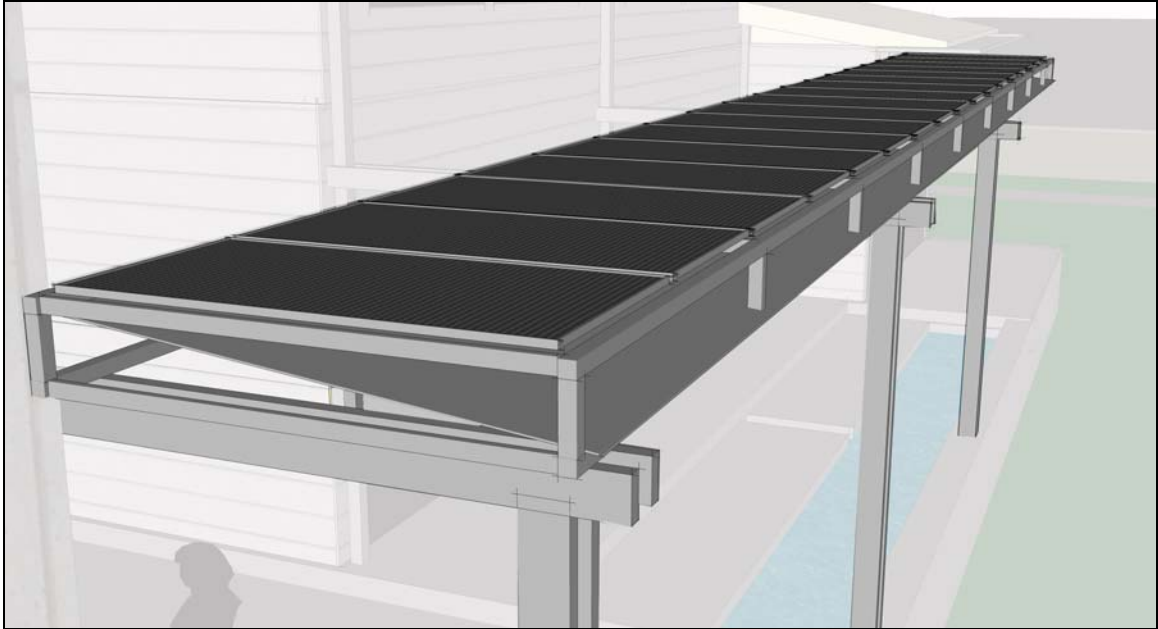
Solar array provides shade, rain water passing through between modules is diverted with a light metal roof system.
